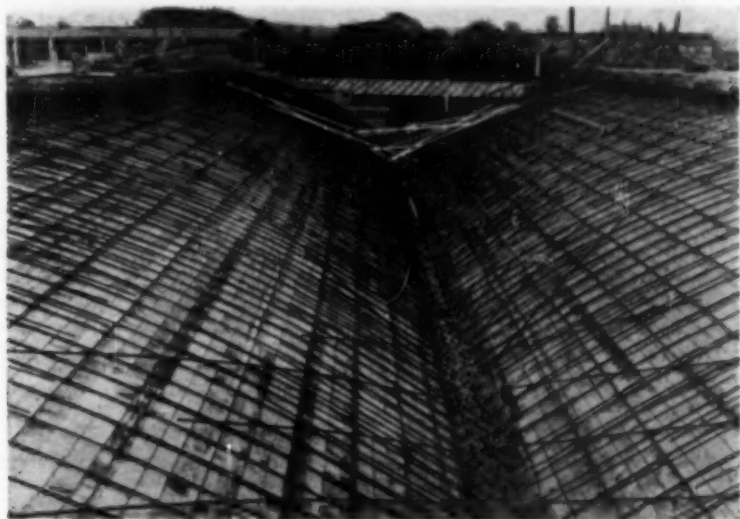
Garage at Donnybrook : Reinforcement for Roof.
